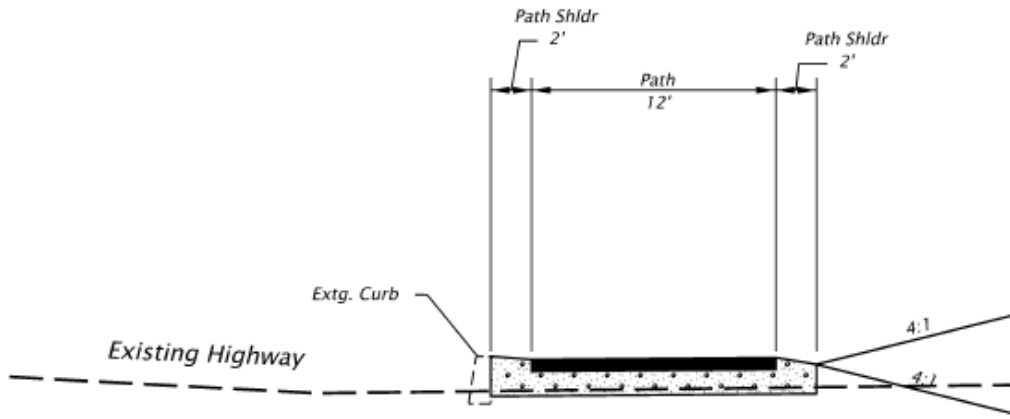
Alternative C2 Existing Curb Typical Cross Section
